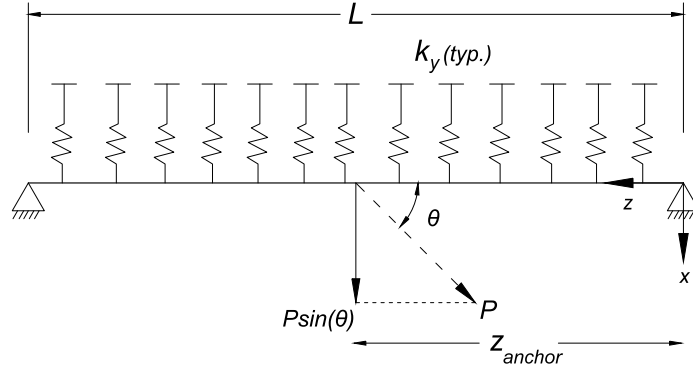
Structural model for a rod anchor located adjacent to a primary frame flange
